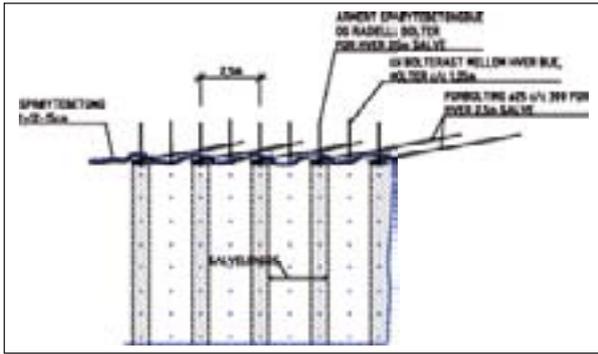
The blue colour indicates sprayed concrete, thickness 12-15 cm, and radial bolts, one set for each blast rounds; in this example the blast round is 2.5 m with a rib close to the face. Spiling, (6 to 8 meter bolt length)
